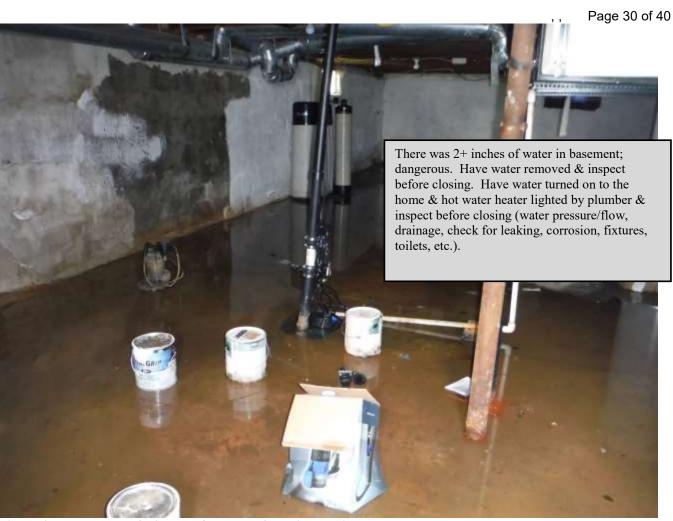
Basement had 2+ inches of water on floor; inaccessible.
